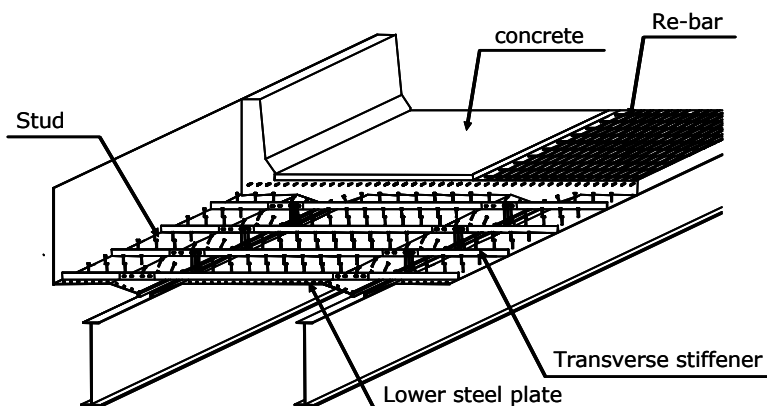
Robinson-type of steel-concrete composite slab.
